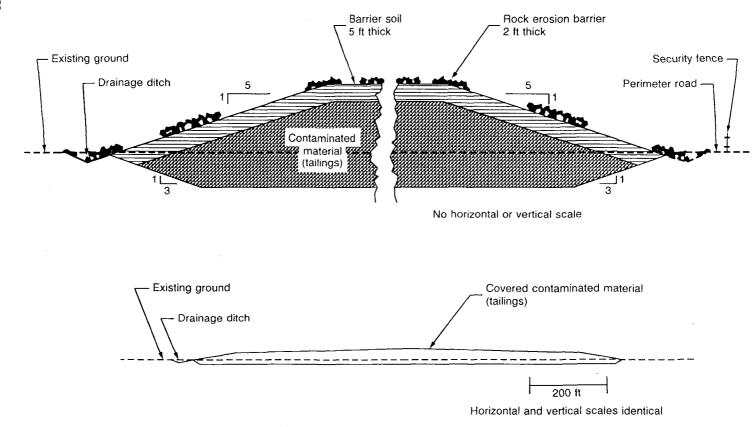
Typical section of embankment at South Clive site (1 ft = 0.3048 m).
